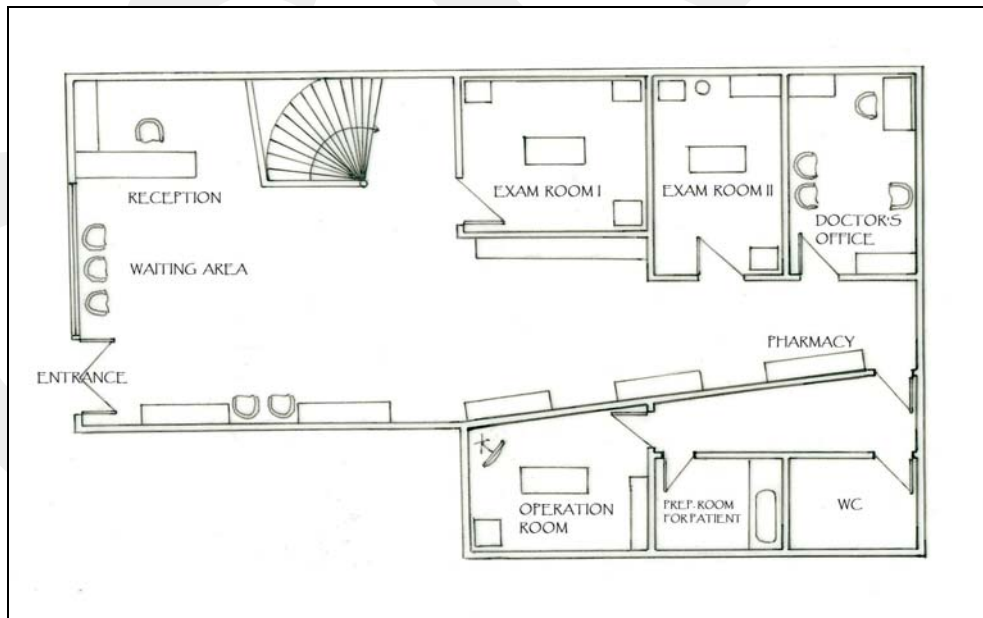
Ground Floor Plan of Ankyra Animal Hospital
